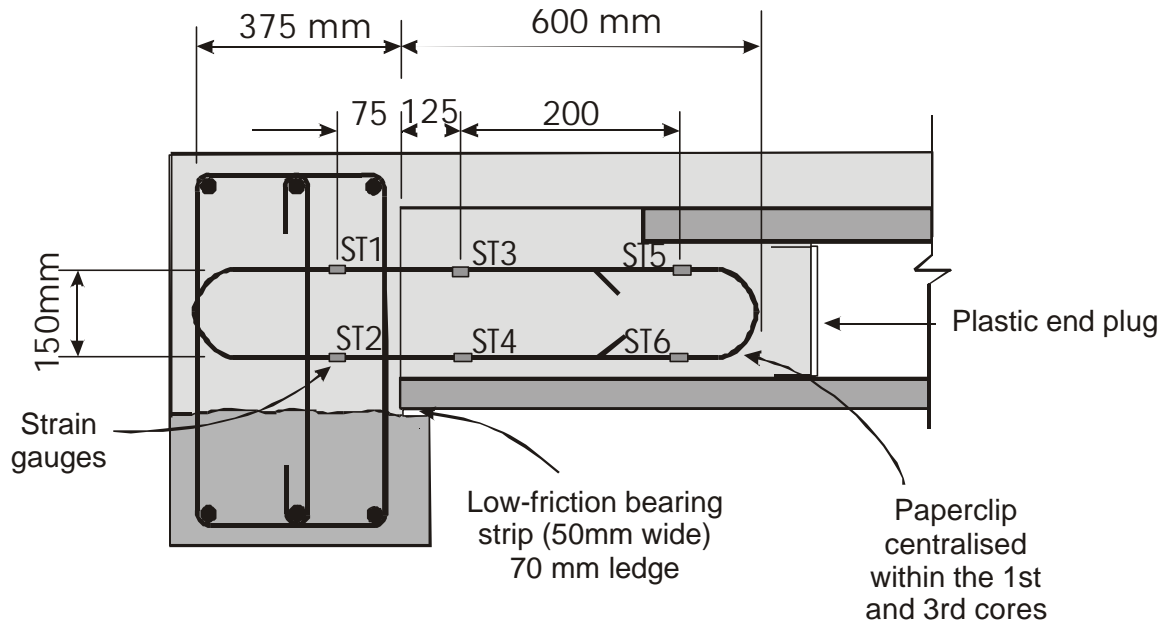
Exact positioning of the paperclip within the connection detail.
